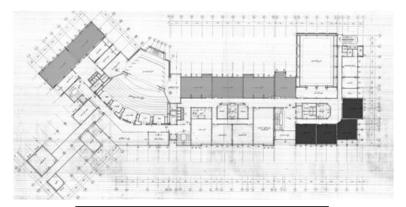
The floor plan of the Academy of Arts illustrates the spaces.
